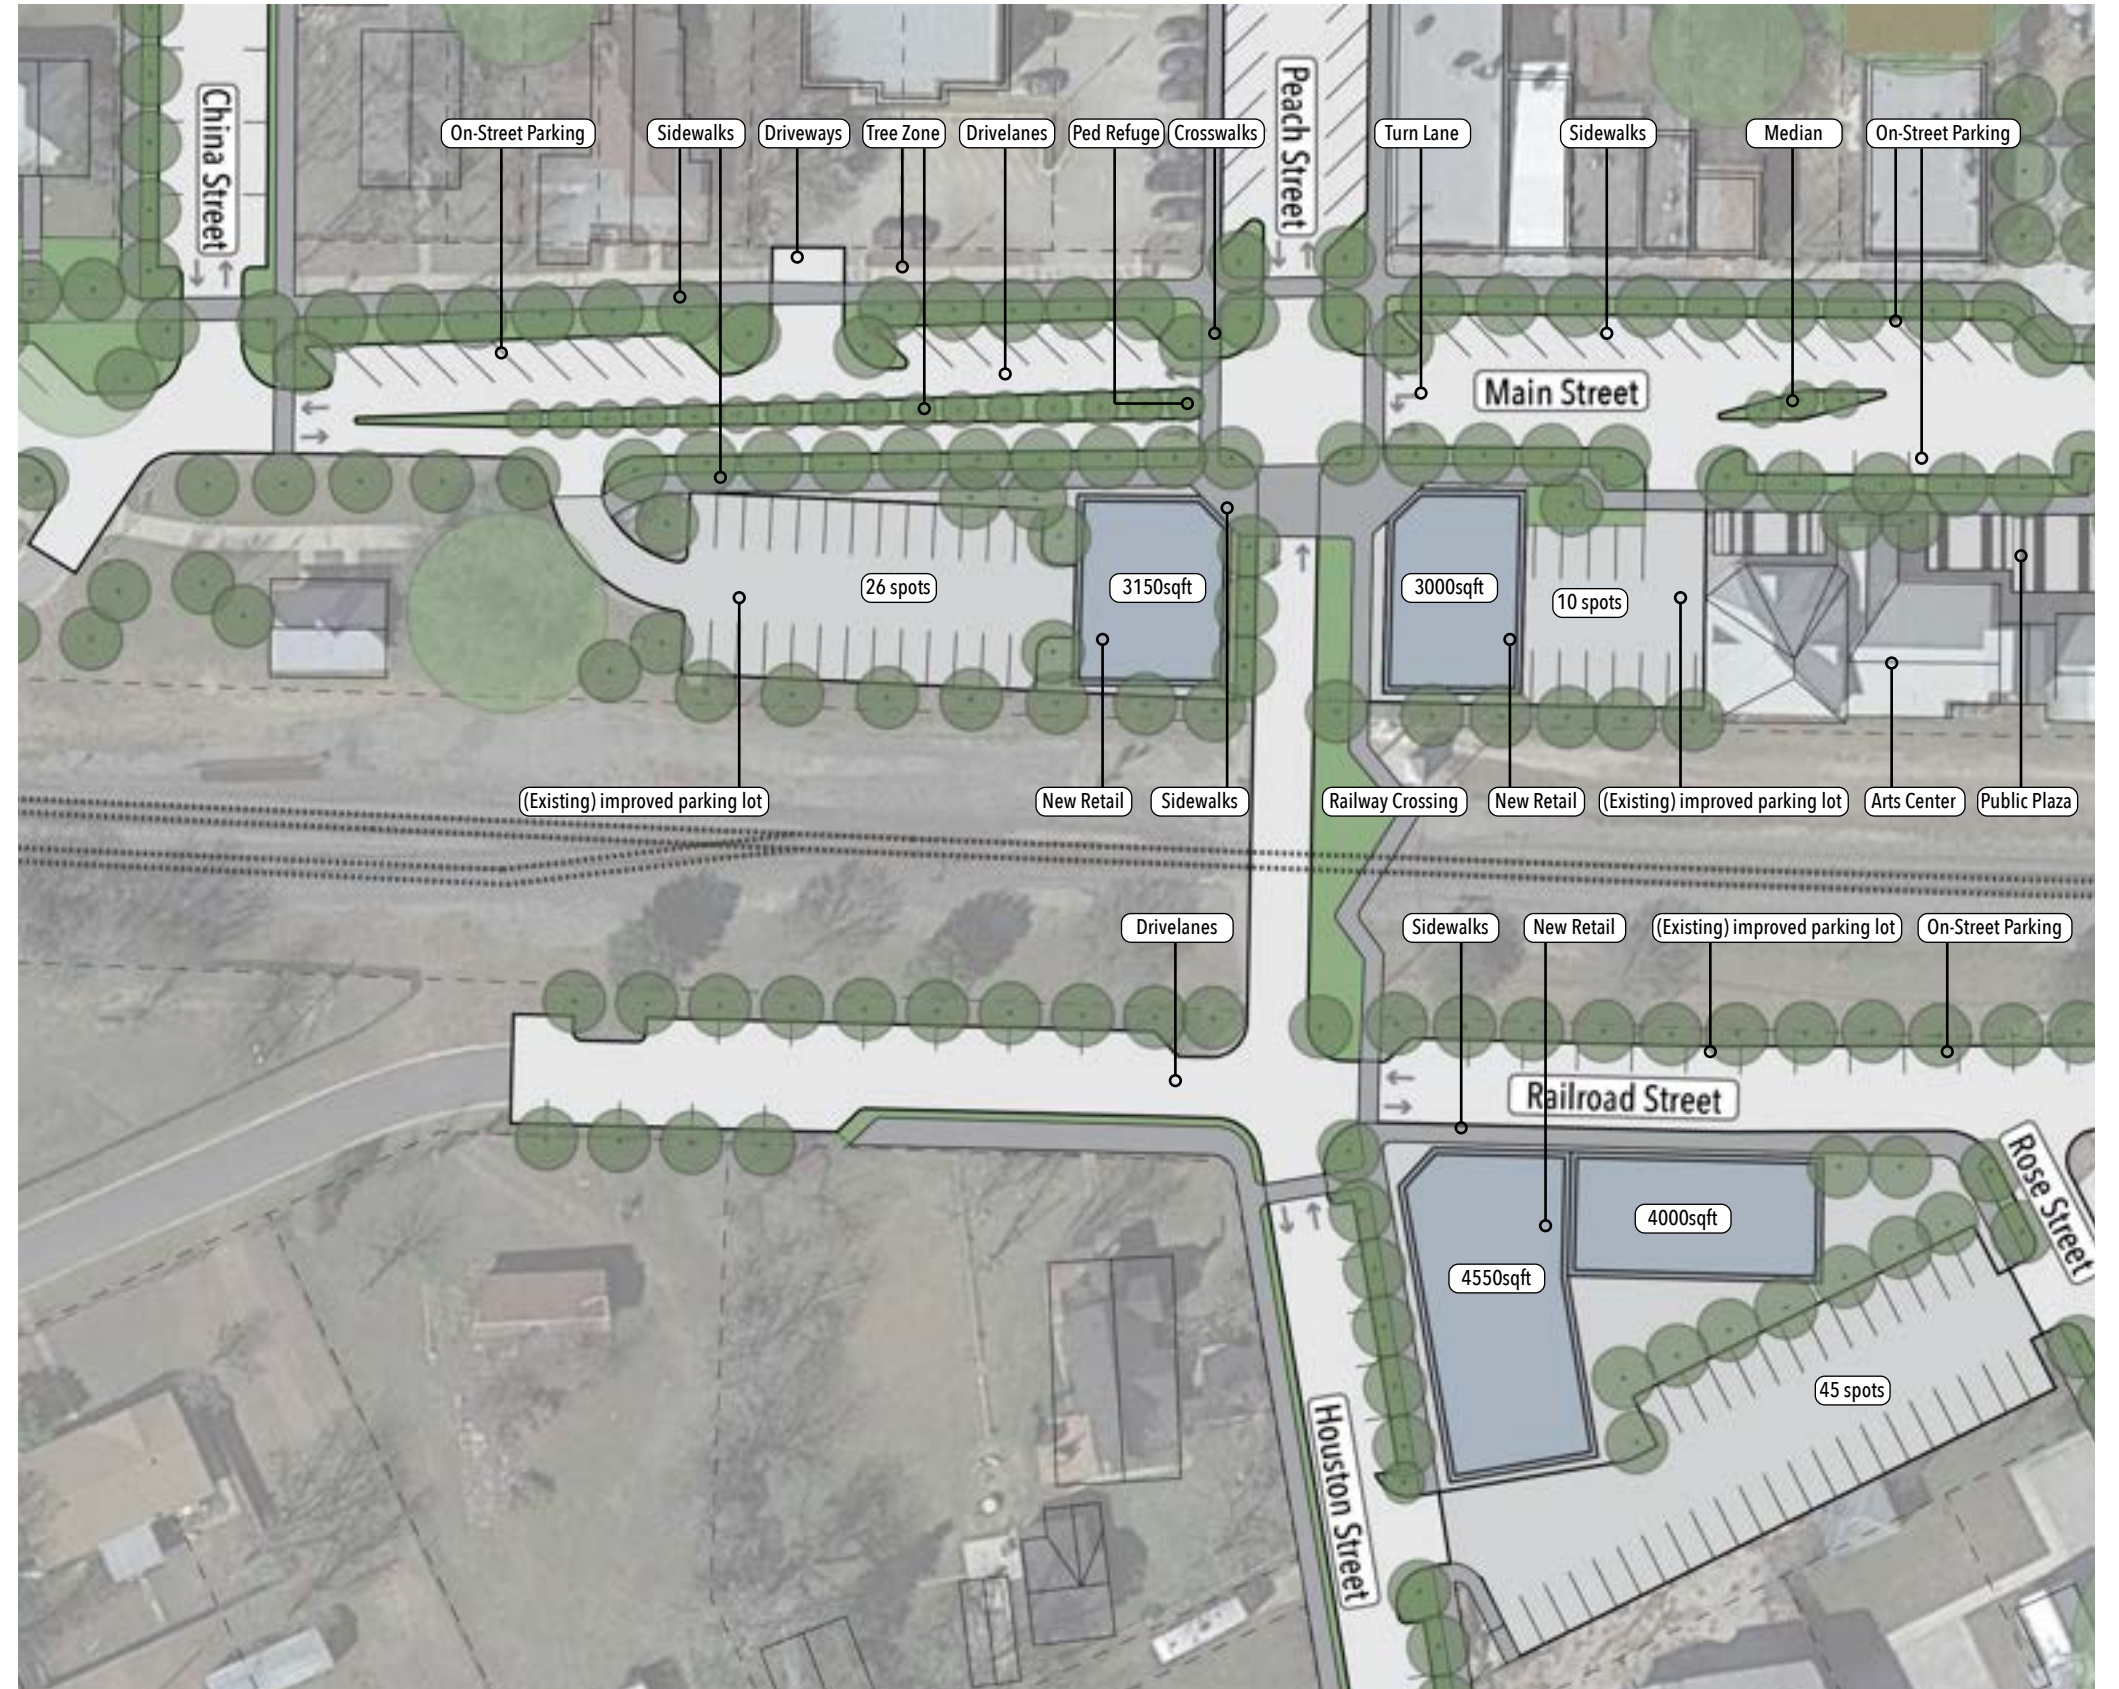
Two-Sided Main Street - Houston St Intersection: Overall Design Concept Plan
